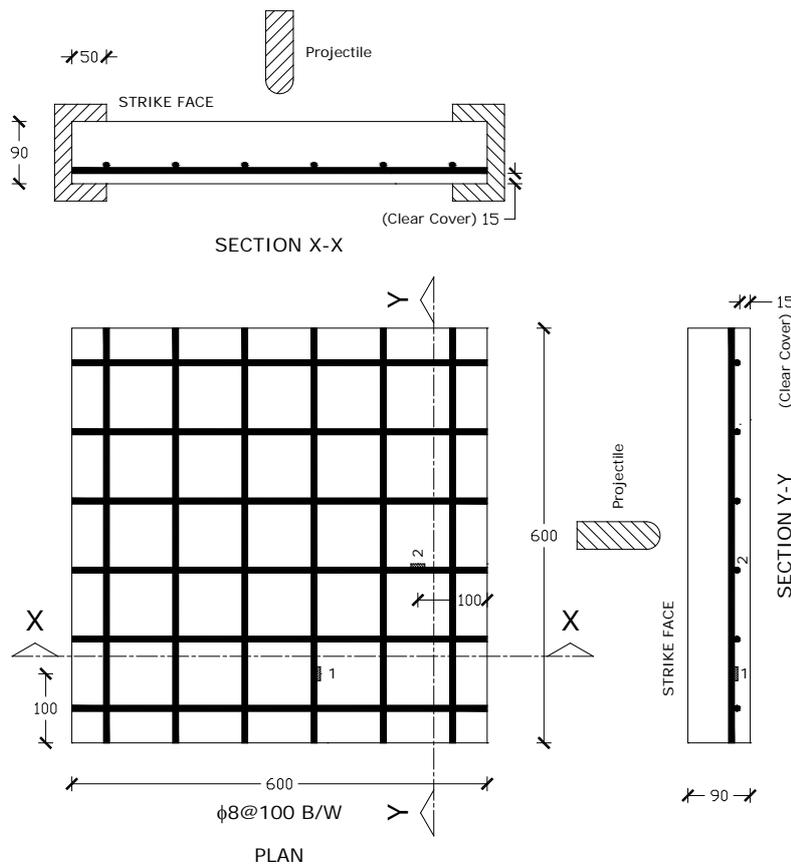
Reinforcement and instrumentation details of the concrete slabs
